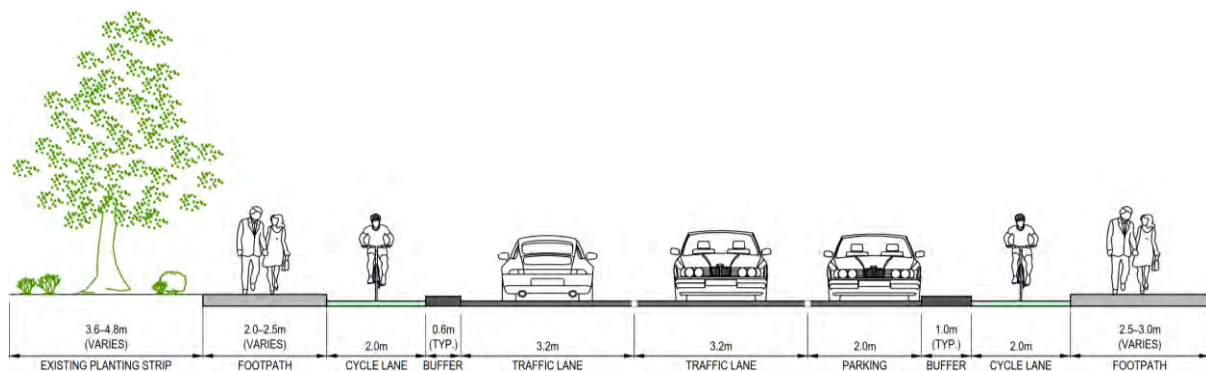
Cross Section 2 – Recommended residential cross section for the short-term upgrades (between the south side of the town centre and Trent Street)
